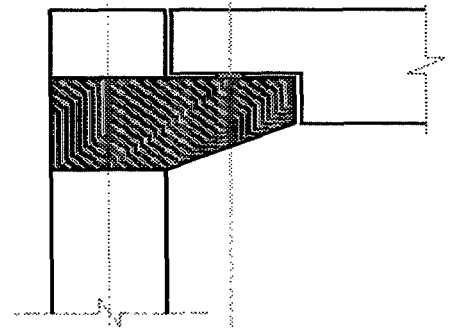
Bridge Longitudinal Beam Resting on Corbel.
